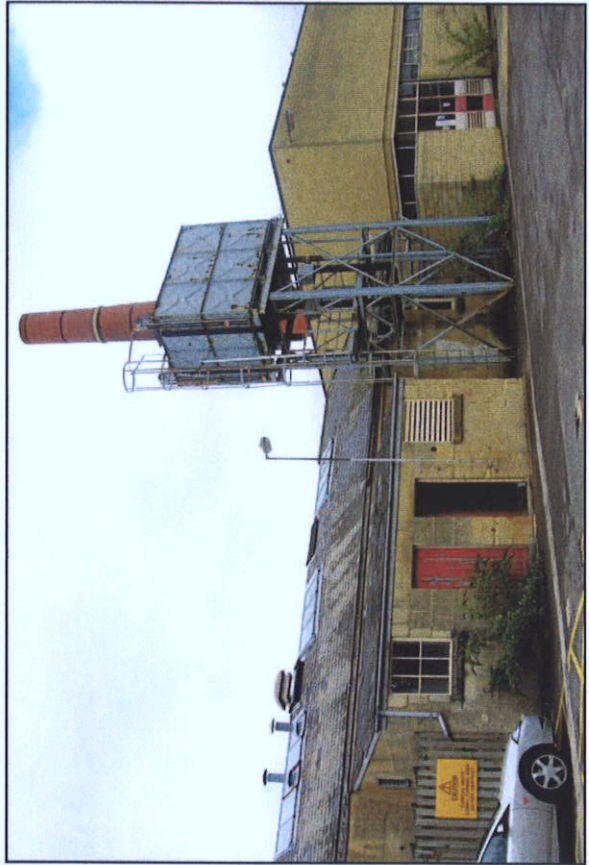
Laundry with modern boiler house and chimney adjoining east end.
